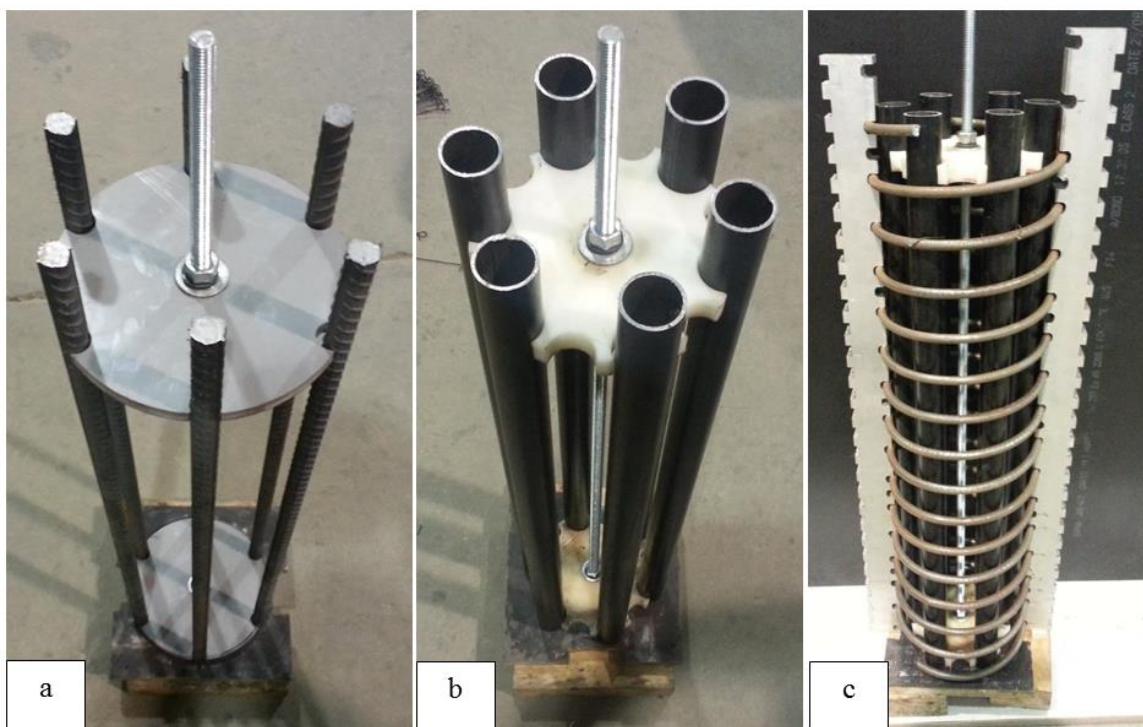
Fabrication of reinforcement cages: (a) longitudinal steel bars; (b) longitudinal steel tubes; (c) transverse reinforcement
